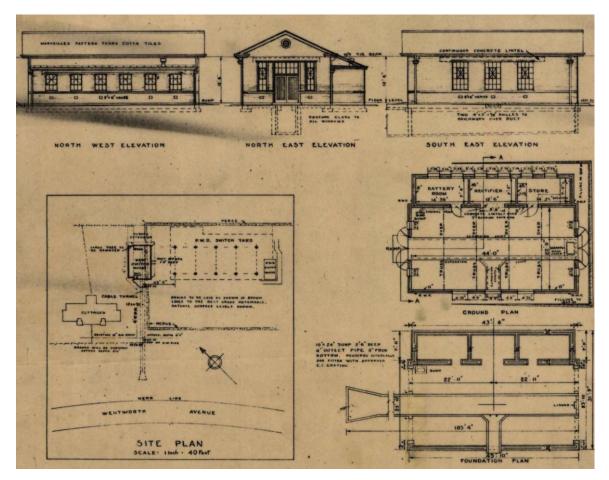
Elevations and plans for the New Switch House at the Electricity Supply Power Station, Kingston, 11 August 1947. Source: National Archives of Australia.
